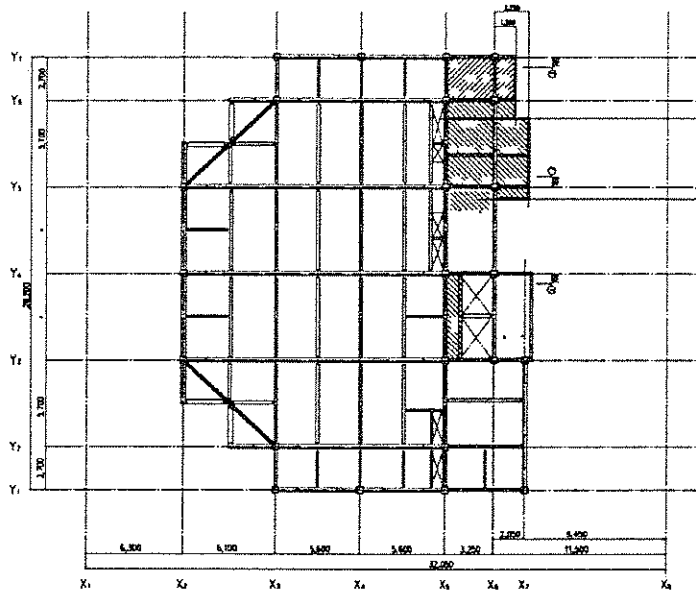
4F - 6F plan of model building (courtesy of KKE)
